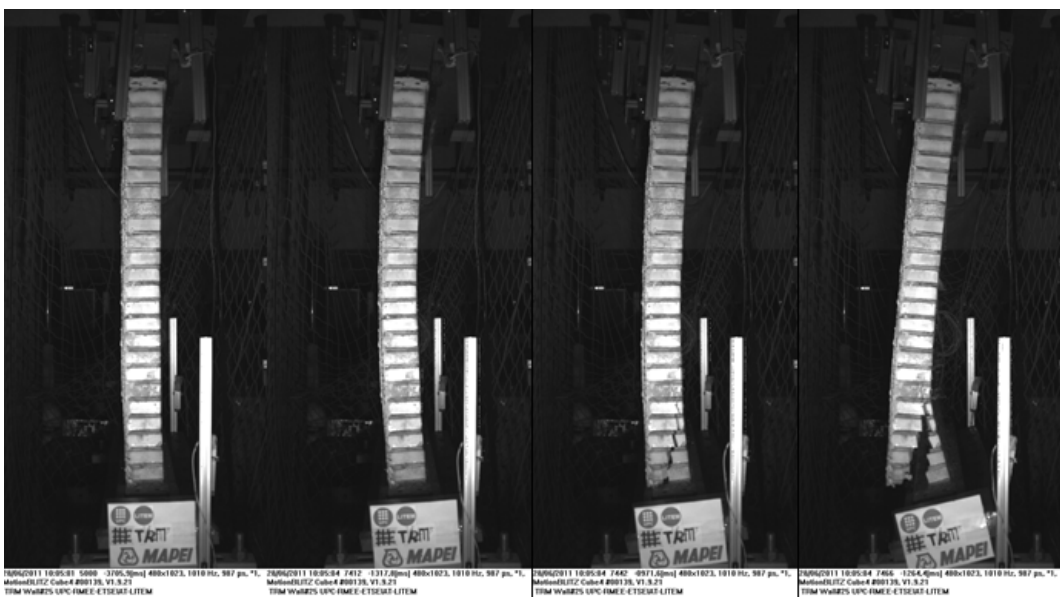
219 Failure of the wall W#25. Masonry failure at wall's bottom.
